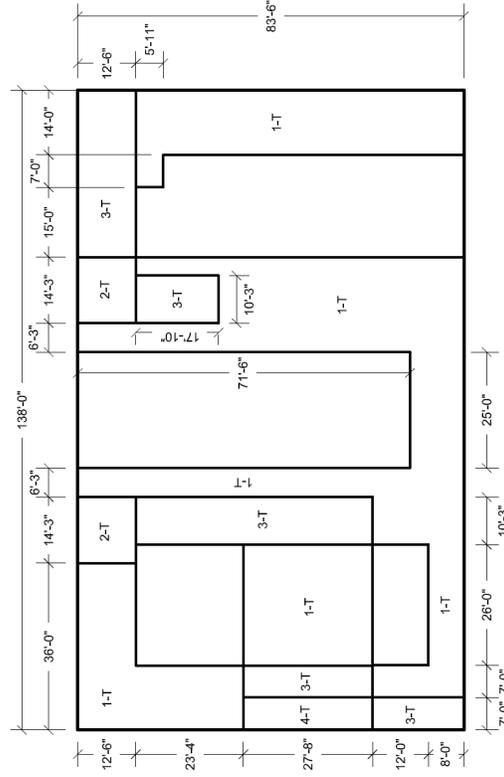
H.6-98: LHS BASIN WEST WALL LOOKING EAST
